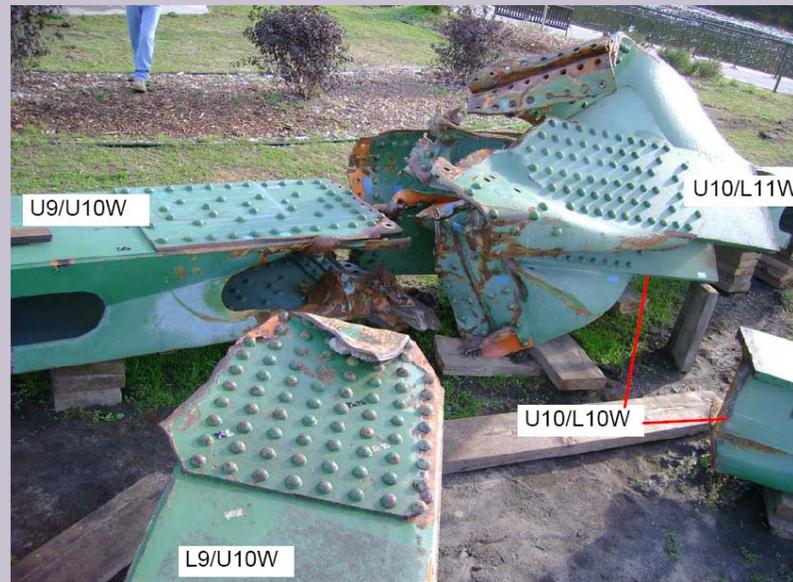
Failed gusset plate from I-35W Bridge collapse [2]
